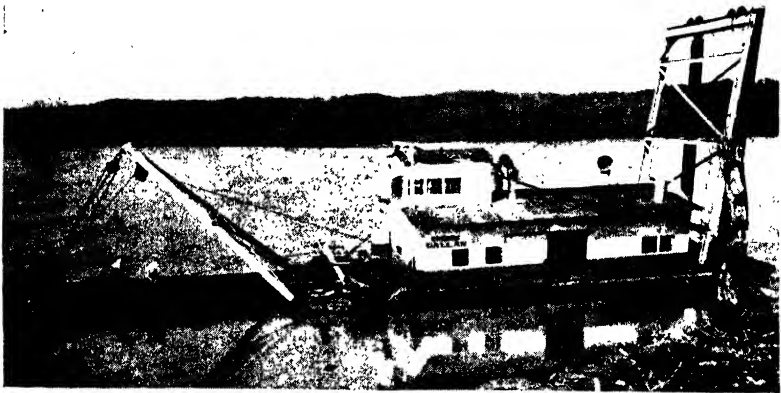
Suction dredge (16 in.) with motor-driven cutterhead.
